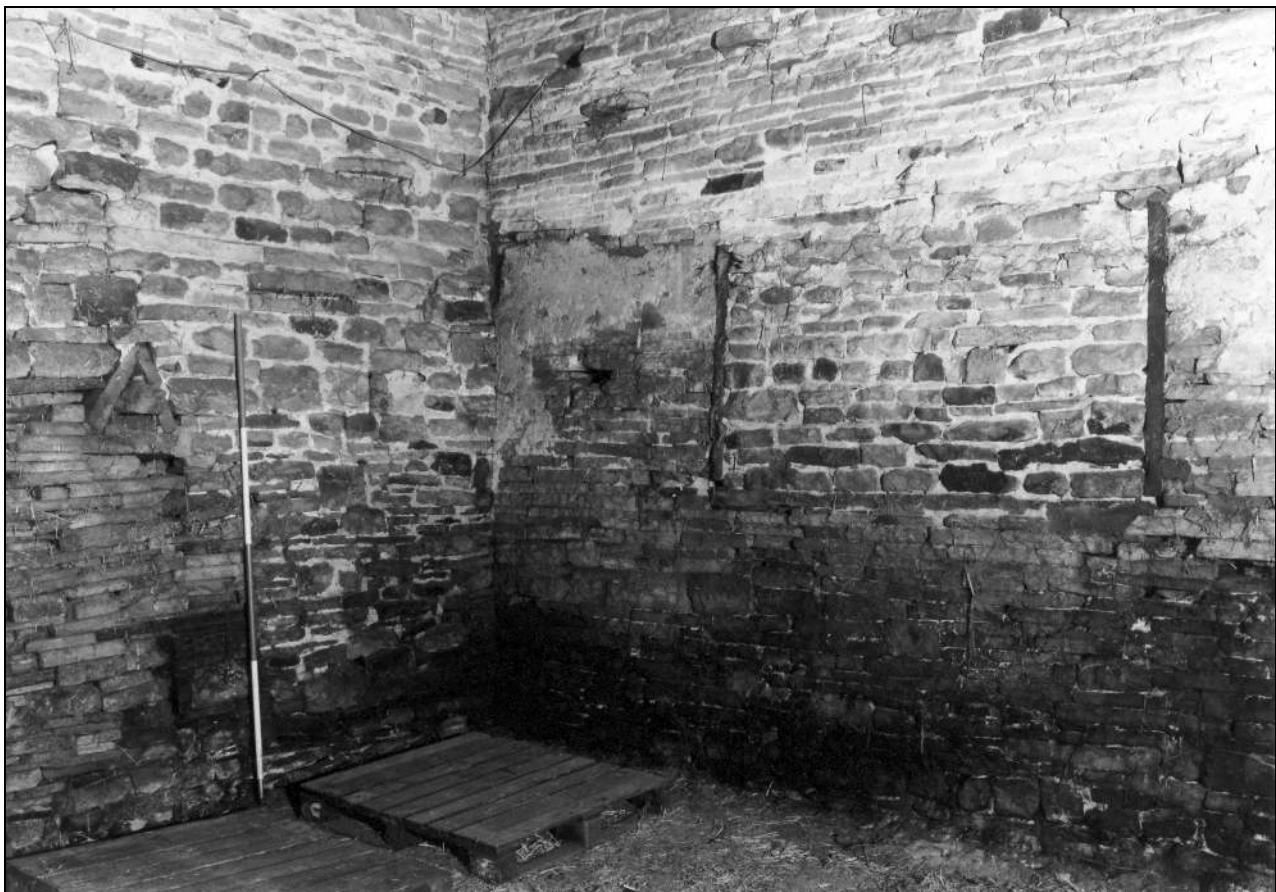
North-east corner inside barn, showing blocked window (?) at right and breather to left (film 5, frame 1)
